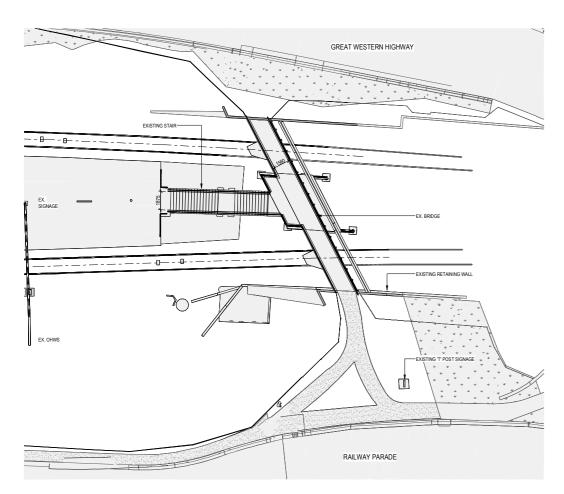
Existing footbridge plan. Source: DesignInc February 2023.
